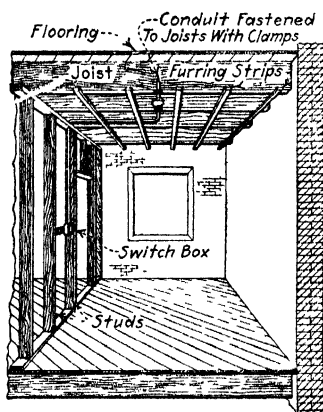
Showing method of supporting conduit in a building where furring strips are employed.
